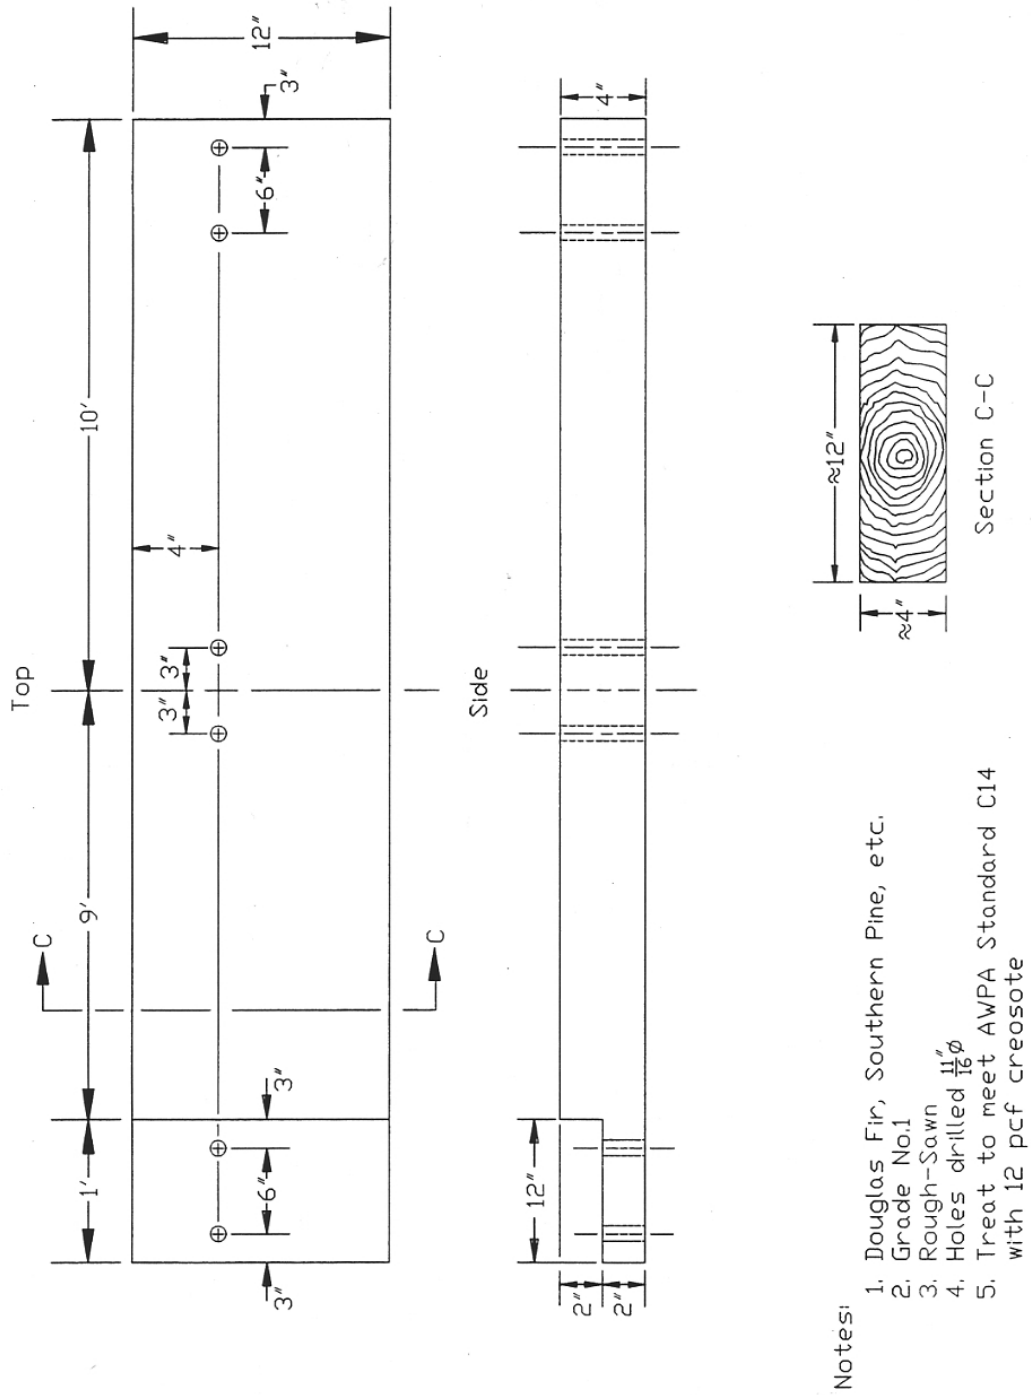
Schematic of Rectangular-Shaped Curb Rail
